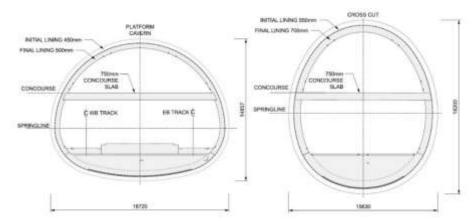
Cross-Section of platform cavern (left) and cross-cut (right)
